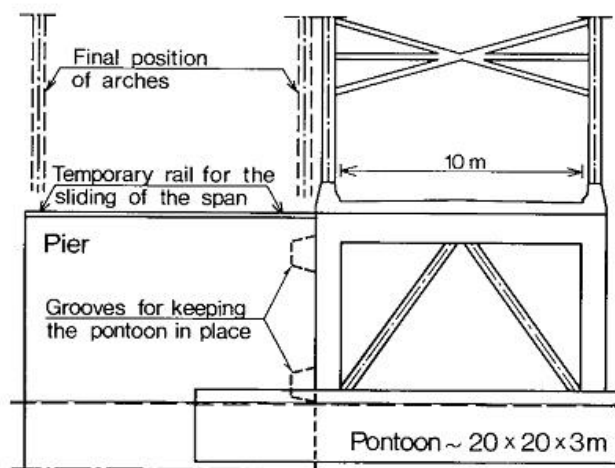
Pontoon and pier with the span on the pontoon ready for transfer
